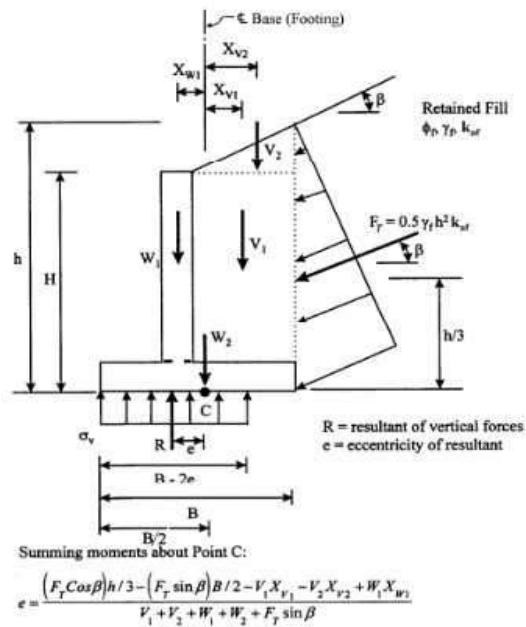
Bearing Stress Criteria for Conventional Wall Foundations on Soil
